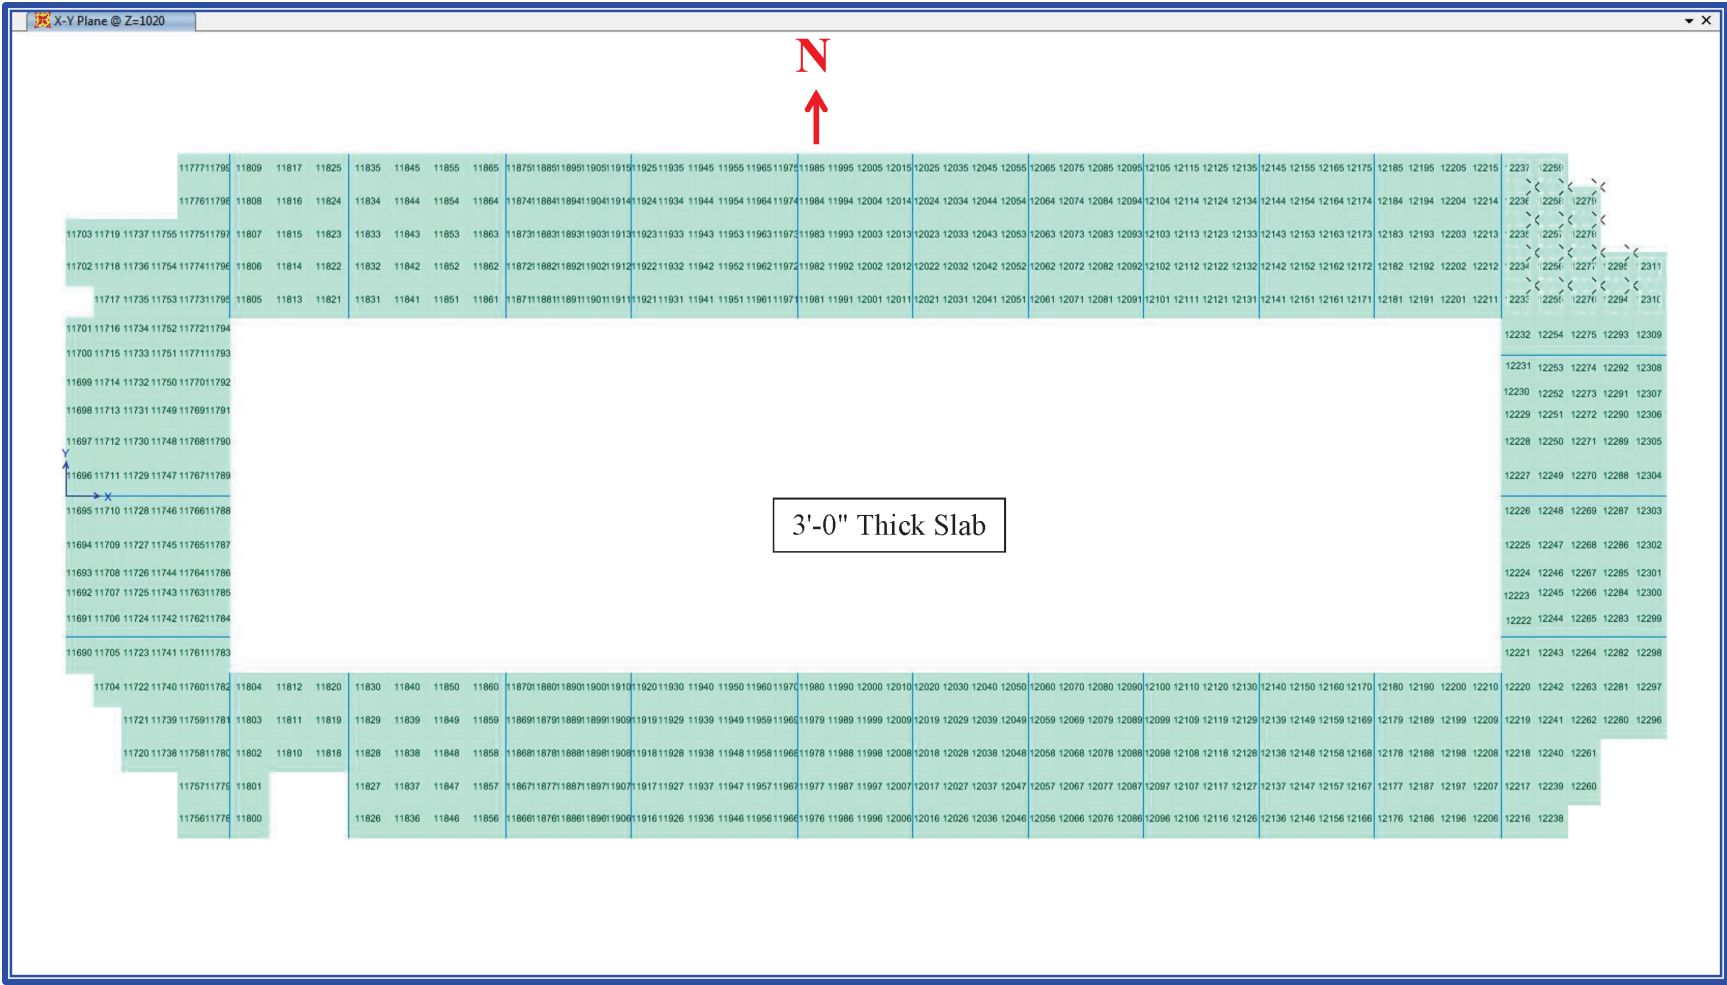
B-26: RXB Reinforcement Plan at EL 100'-0"
